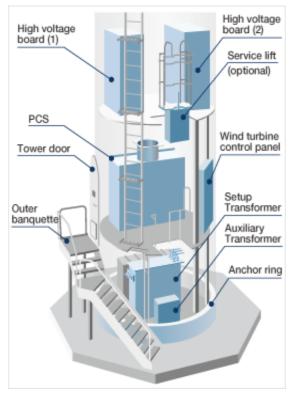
Equipment layout in the tower (Hitachi, n.d.)
